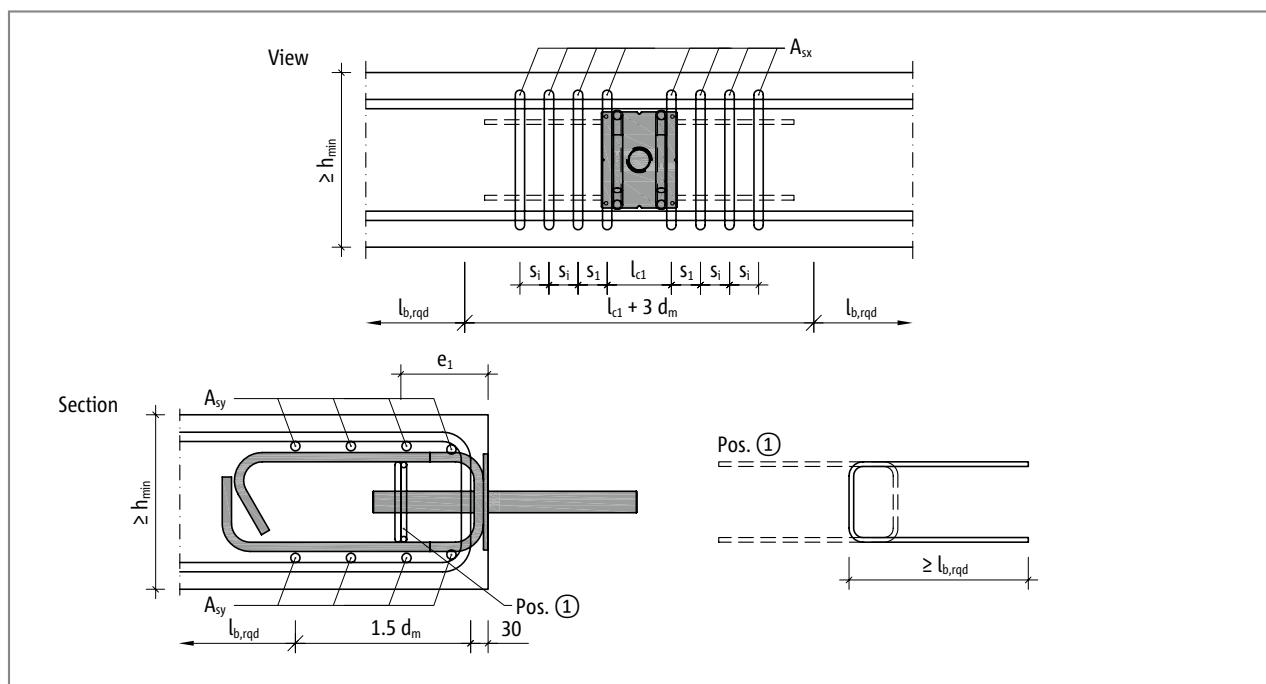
Schöck Dorn type SLD-Q 120, SLD-Q 150: On-site reinforcement
